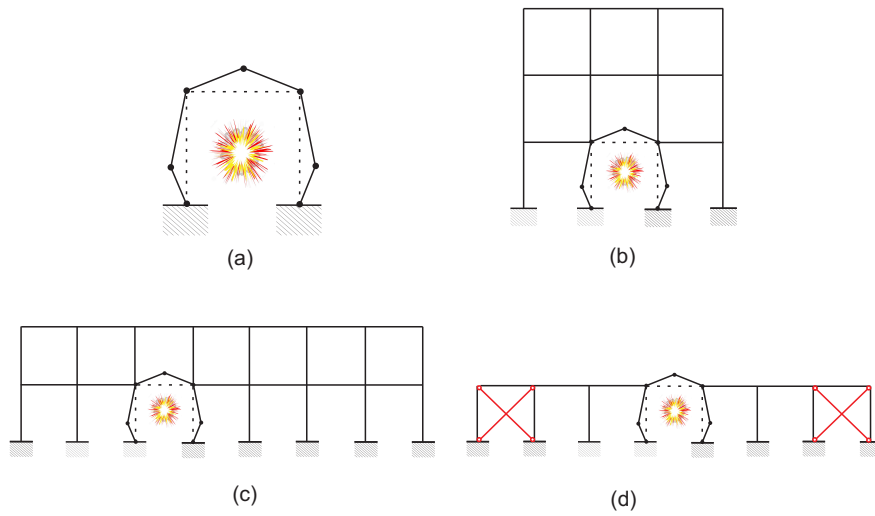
Steel structure configurations with IPE 270 beams (5.4 m), HEA 240 columns (4.5 m), CHS 175x5 braces and a linear mass of the floor equals to 2500 kg/m .
